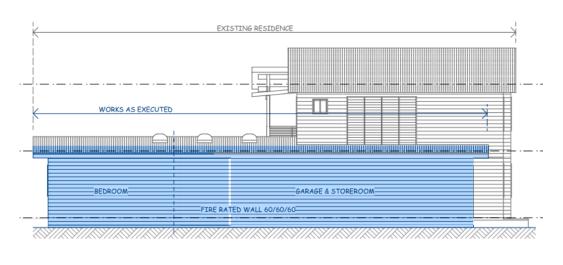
East elevation of the original MA plans. The existing garage structure is in blue.
